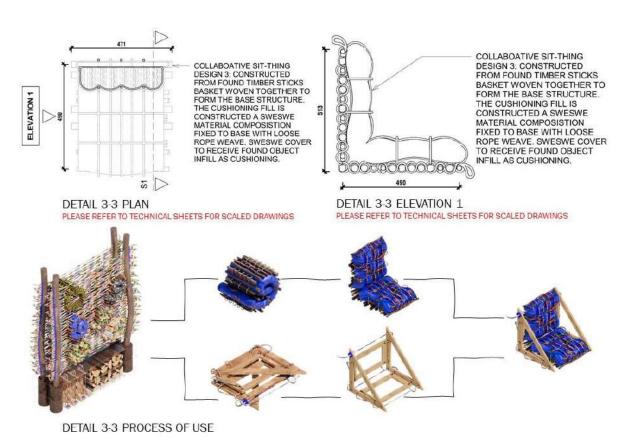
Technical drawings of detail 3.3 as specified (Author, 2021).
